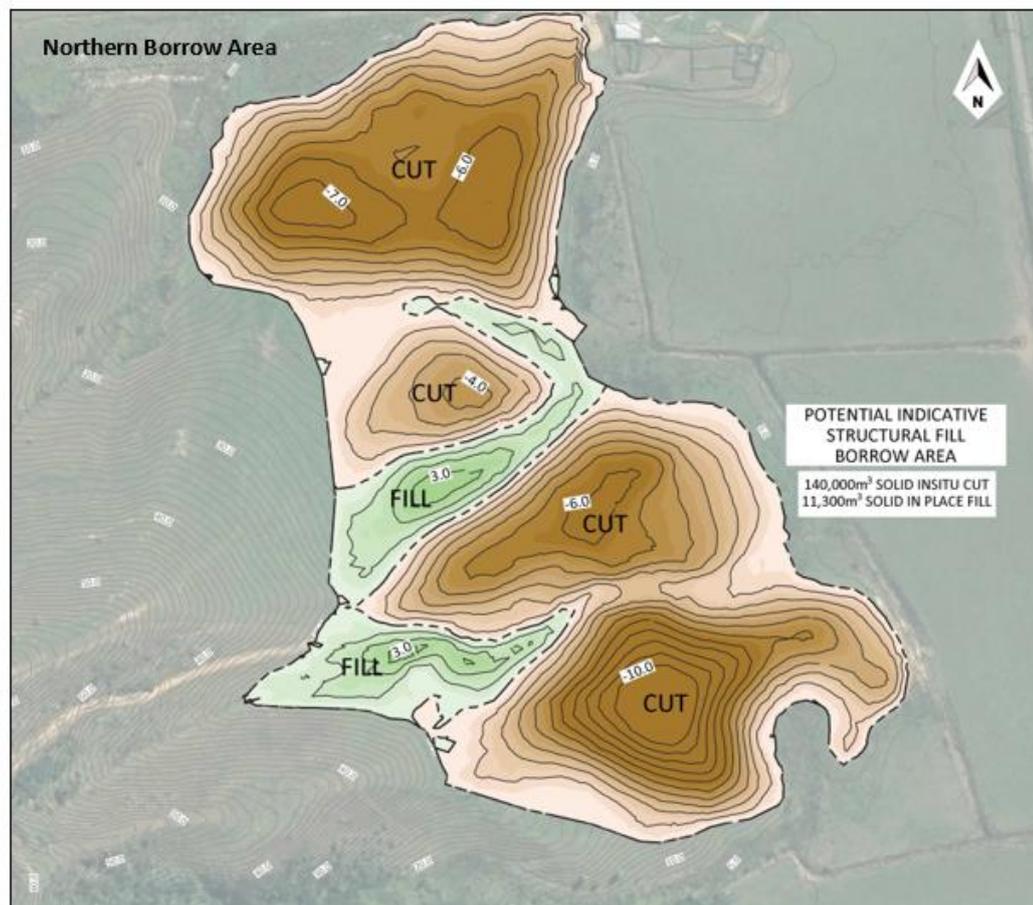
Cut fill plan for the Northern Borrow Area (source: Civil Plan Consultants Ltd)
